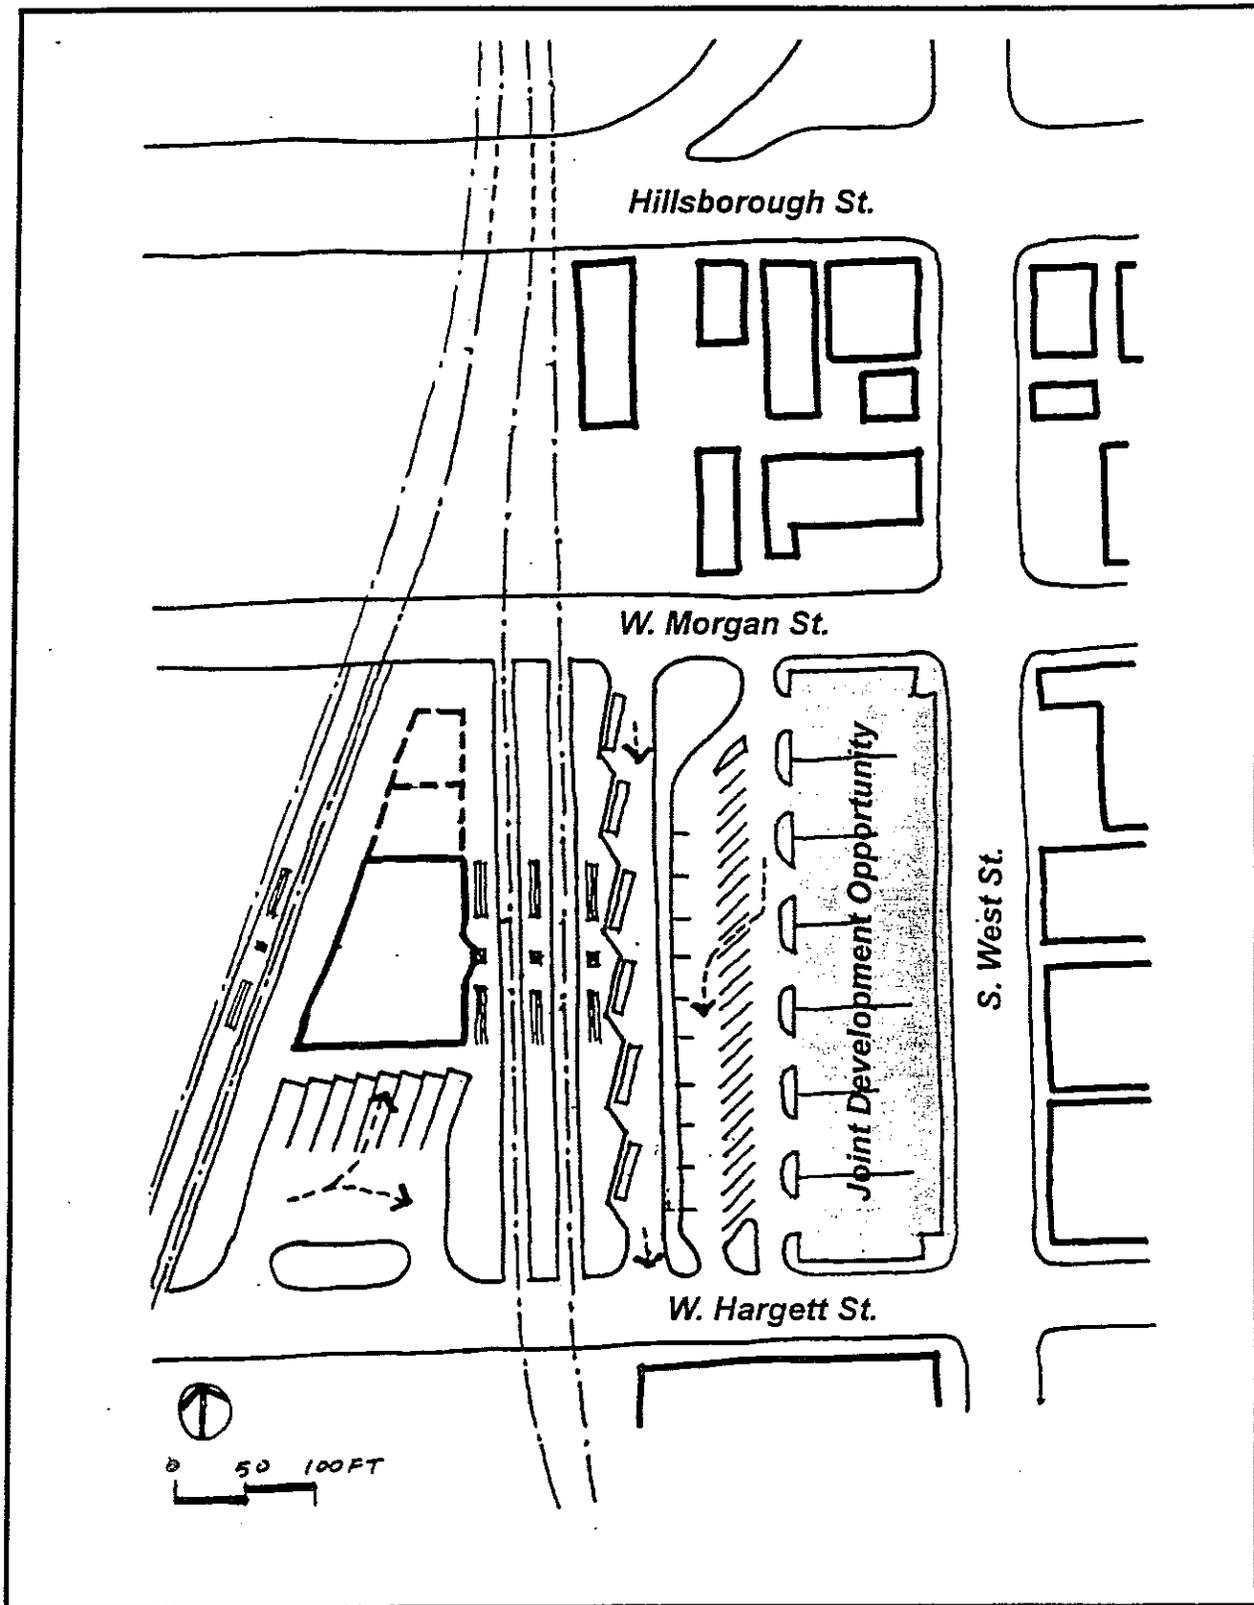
Site 3/North Leg of the Railroad Triangle
